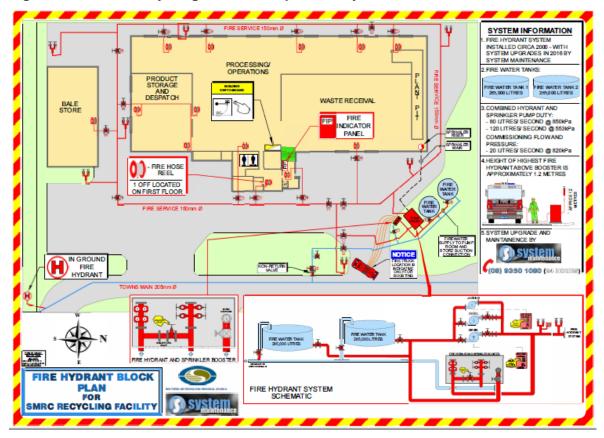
SMRC Recycling Plant Fire Hydrant System
